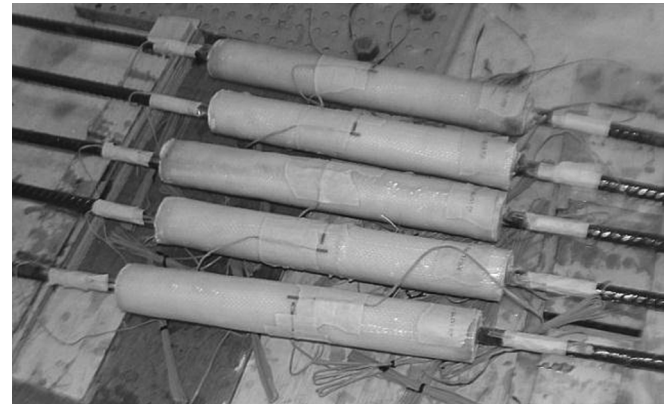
GSSC specimens with GFRP sheets for pull-out tests.
